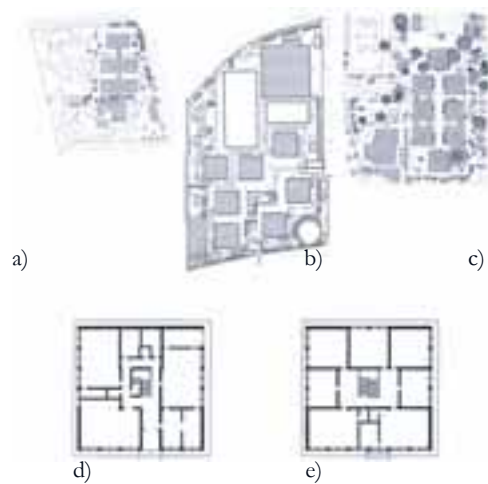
“3x3 Project: different site locations”: a) José Saramago Secondary School, Mafra; b) Dr. António Carvalho Figueiredo Secondary School, Loures; c) Ponte de Sôr Secondary School, Ponte de Sôr; d) Plan of the standard-block – ground floor; e) Plan of the standard -block – upper floors (Heitor, 2014, p.515)
